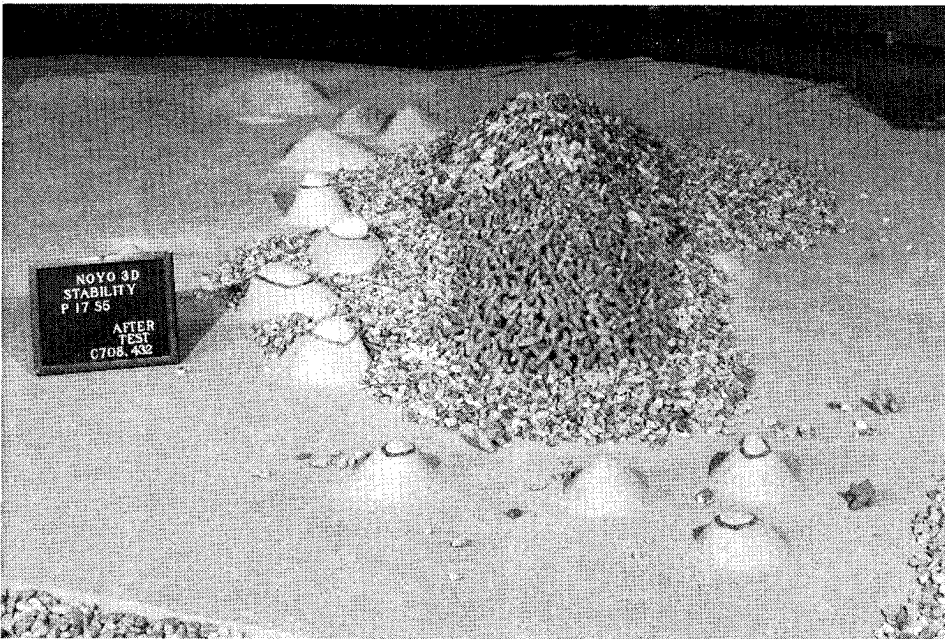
Plan 17, south roundhead after five series of modified Storm IB waves
